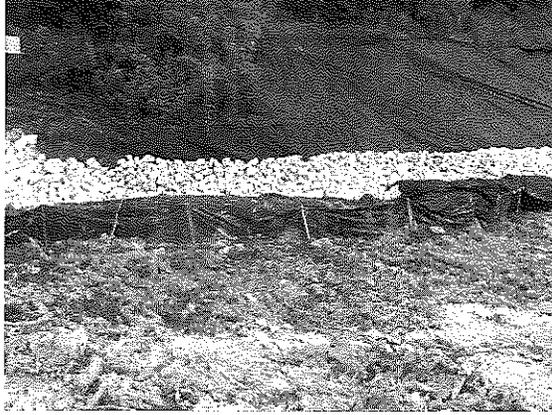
Silt fence not installed per specs and area not stabilized at Sta. 140+00-140+50
